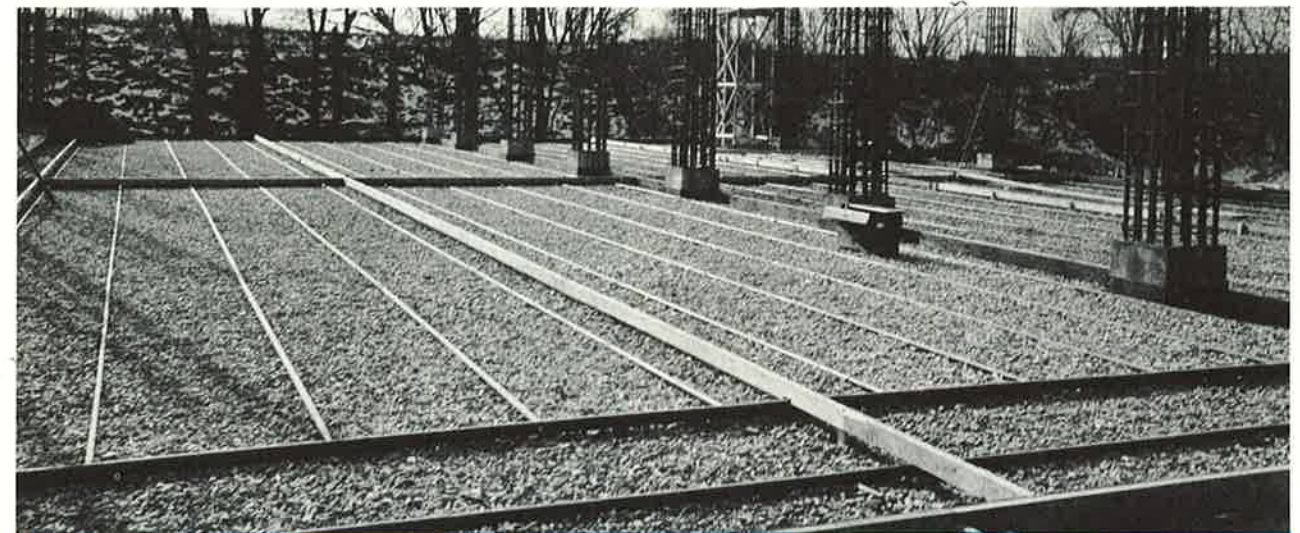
Not for snow removal but for the prevention of damage to expensive, insulated floors in this extensive installation beneath the cold storage plant of Penn Dairies, Inc., Lancaster, Pa. Similar installations have been made in other cold storage plants.
